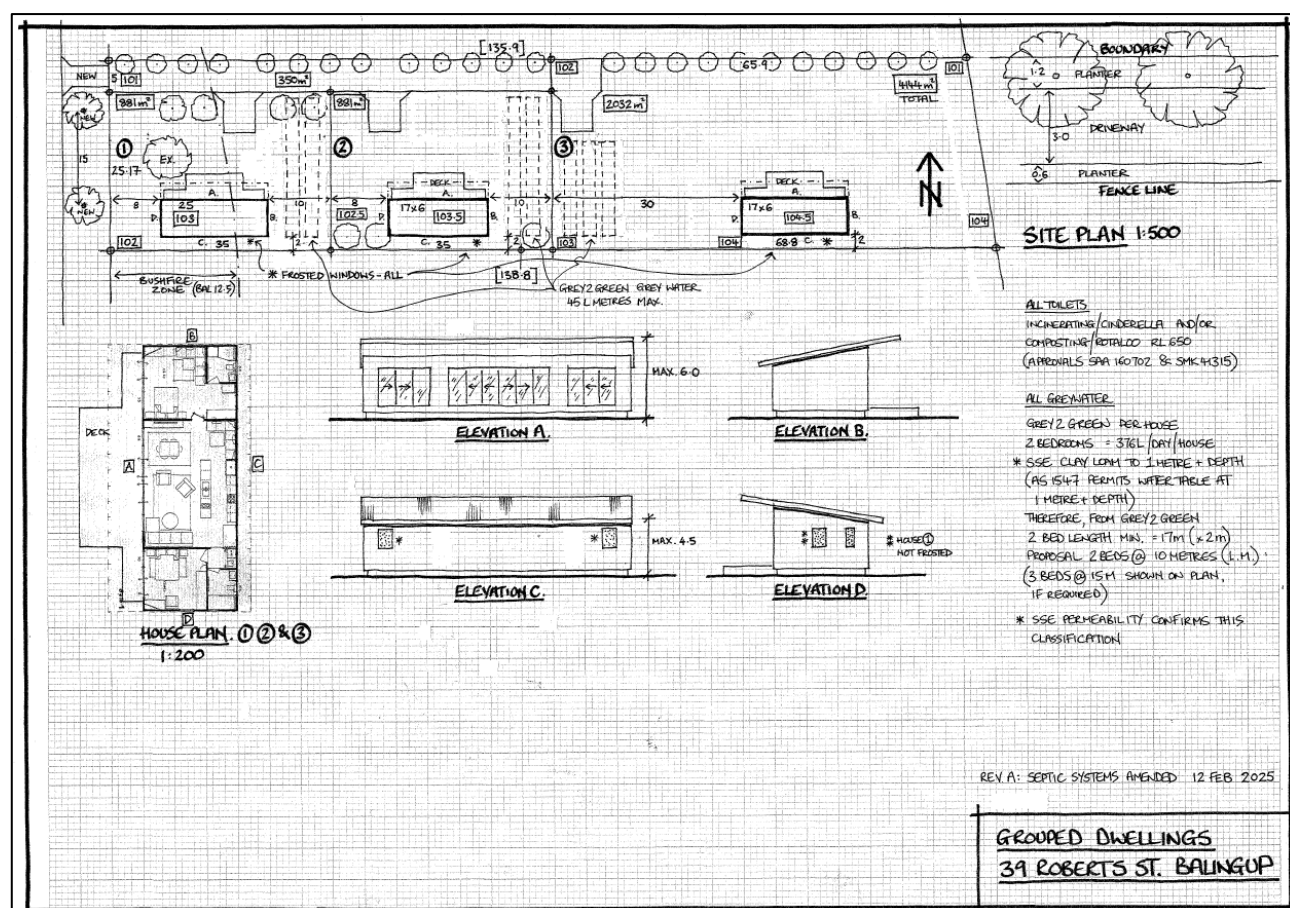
39 Roberts Street Plans dated 12 February 2025
